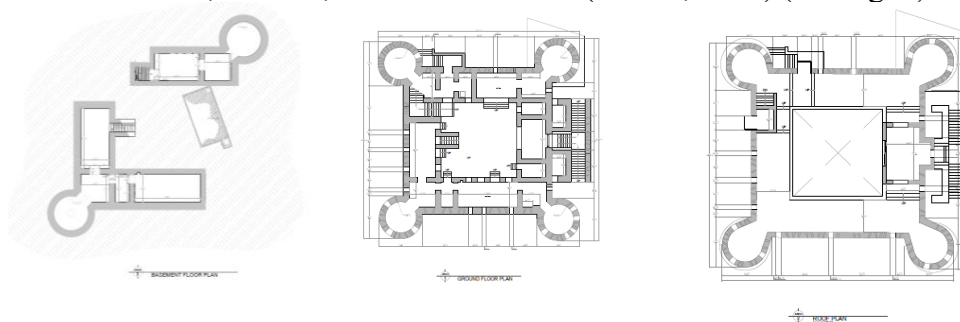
The horizontal plan of basement, ground, and roof floor, respectively
